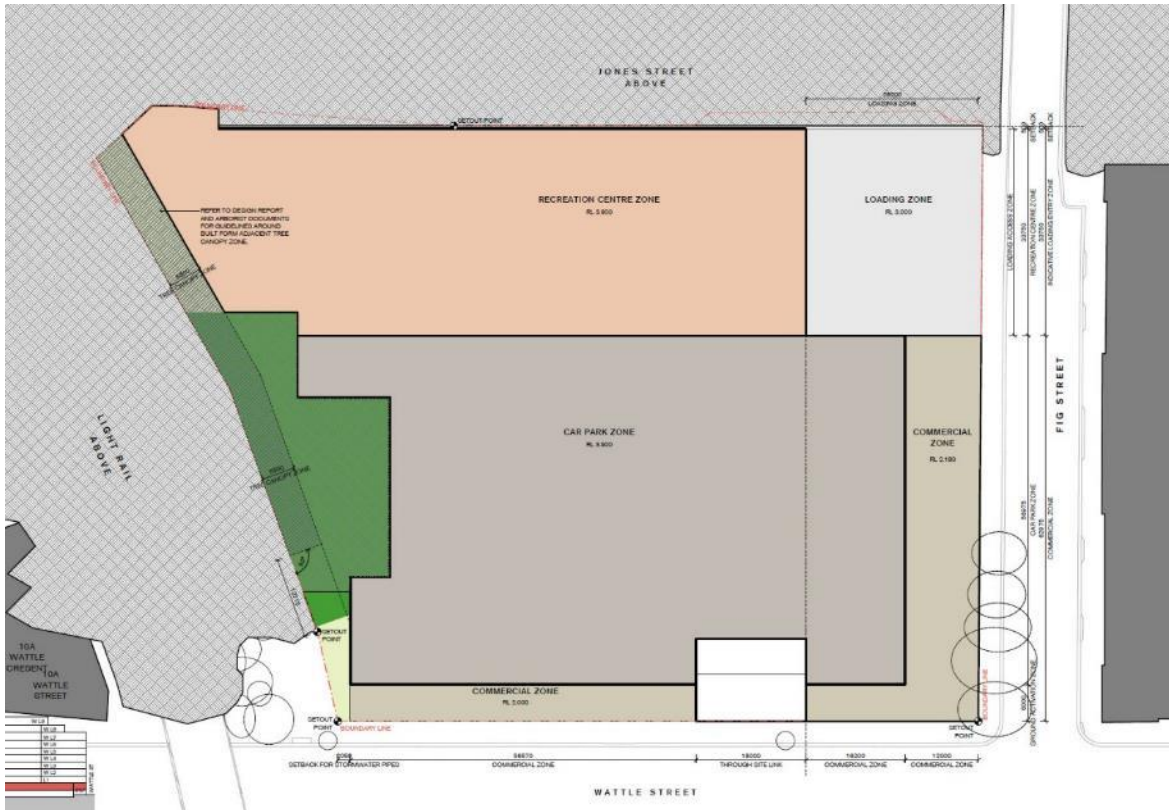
Envelope plans: Approved Basement 2 and proposed Level 00
